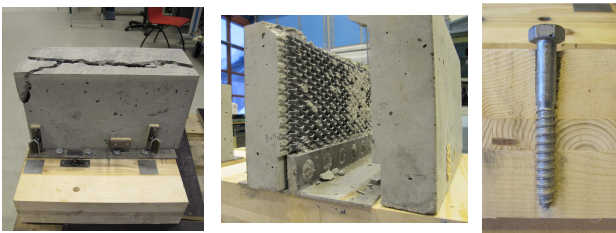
Pictures of the failure in the concrete (Test series M-8S-100)
